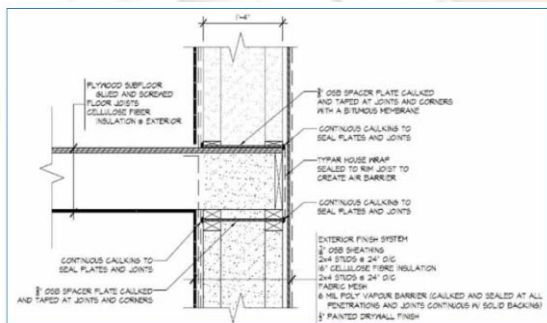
Cross-Section of Riverdale NetZero Deep Wall System
